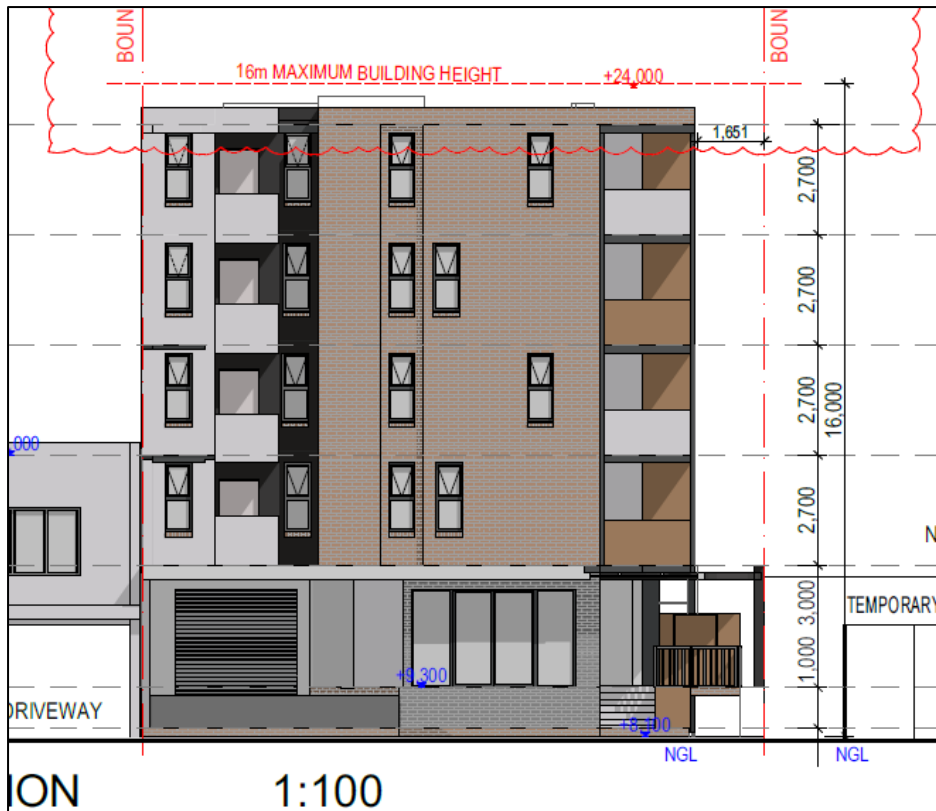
Approved North Elevation – DA 2018/67/1 (dated 1 March 2019)
